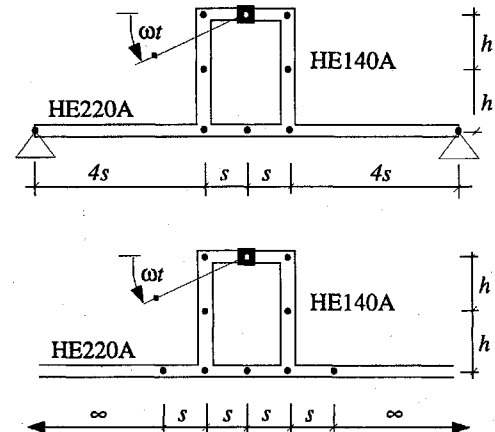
Geometry of plane frame structure; upper part shows simply supported foundation and lower part shows infinite foundation.
